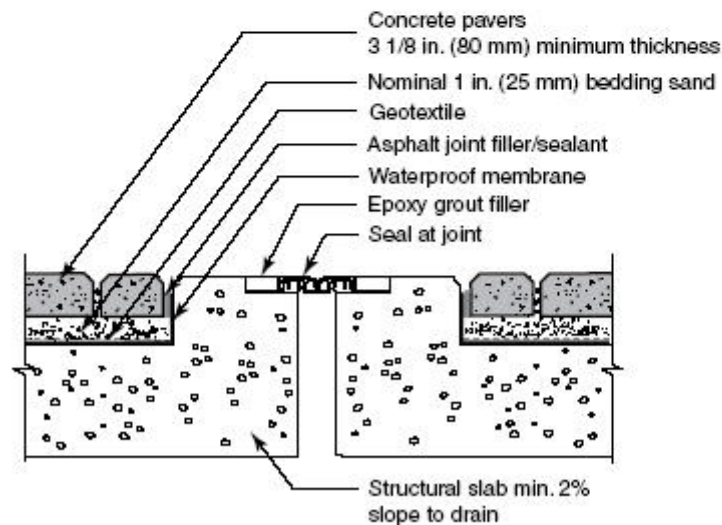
Edge restraint detail at a roof expansion joint for vehicular applications
